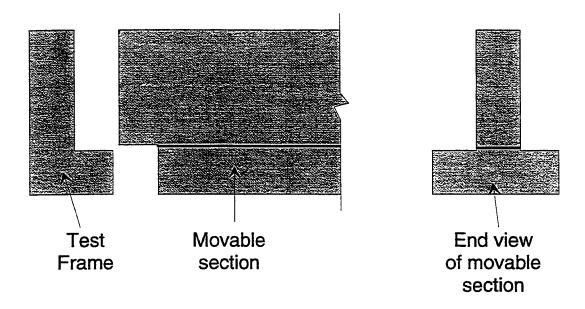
The movable concrete support used to change the floor size by supporting different joist lengths.
